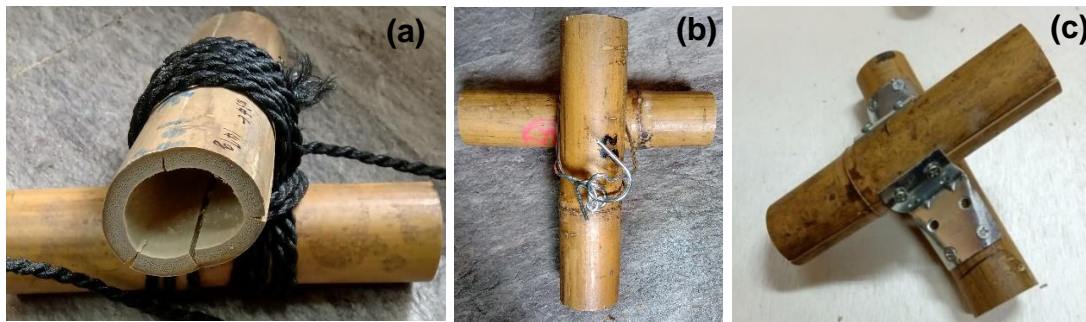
Failure mode of tensile test in lashing joint(a), iron wire joint(b) and steel angle bracket joint(c)
